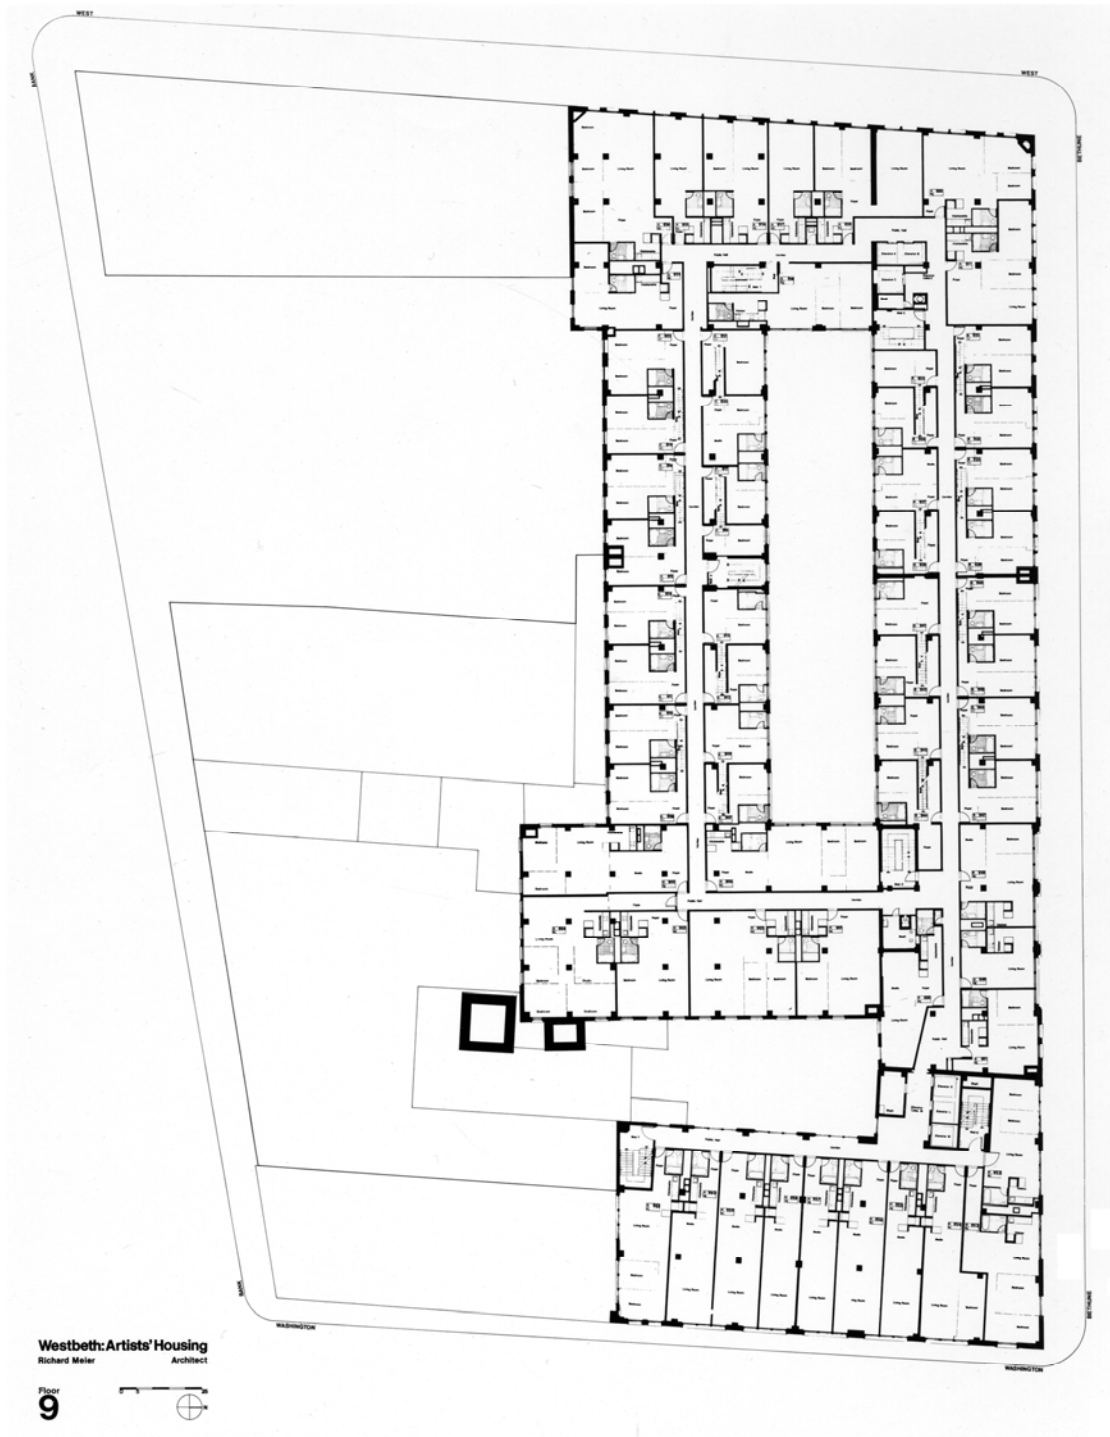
Westbeth Artists' Colony. Plan, ninth floor.
